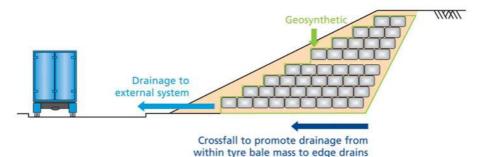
Schematic cross-section showing a typical layout of a slope failure repair (after Anon 2007).
